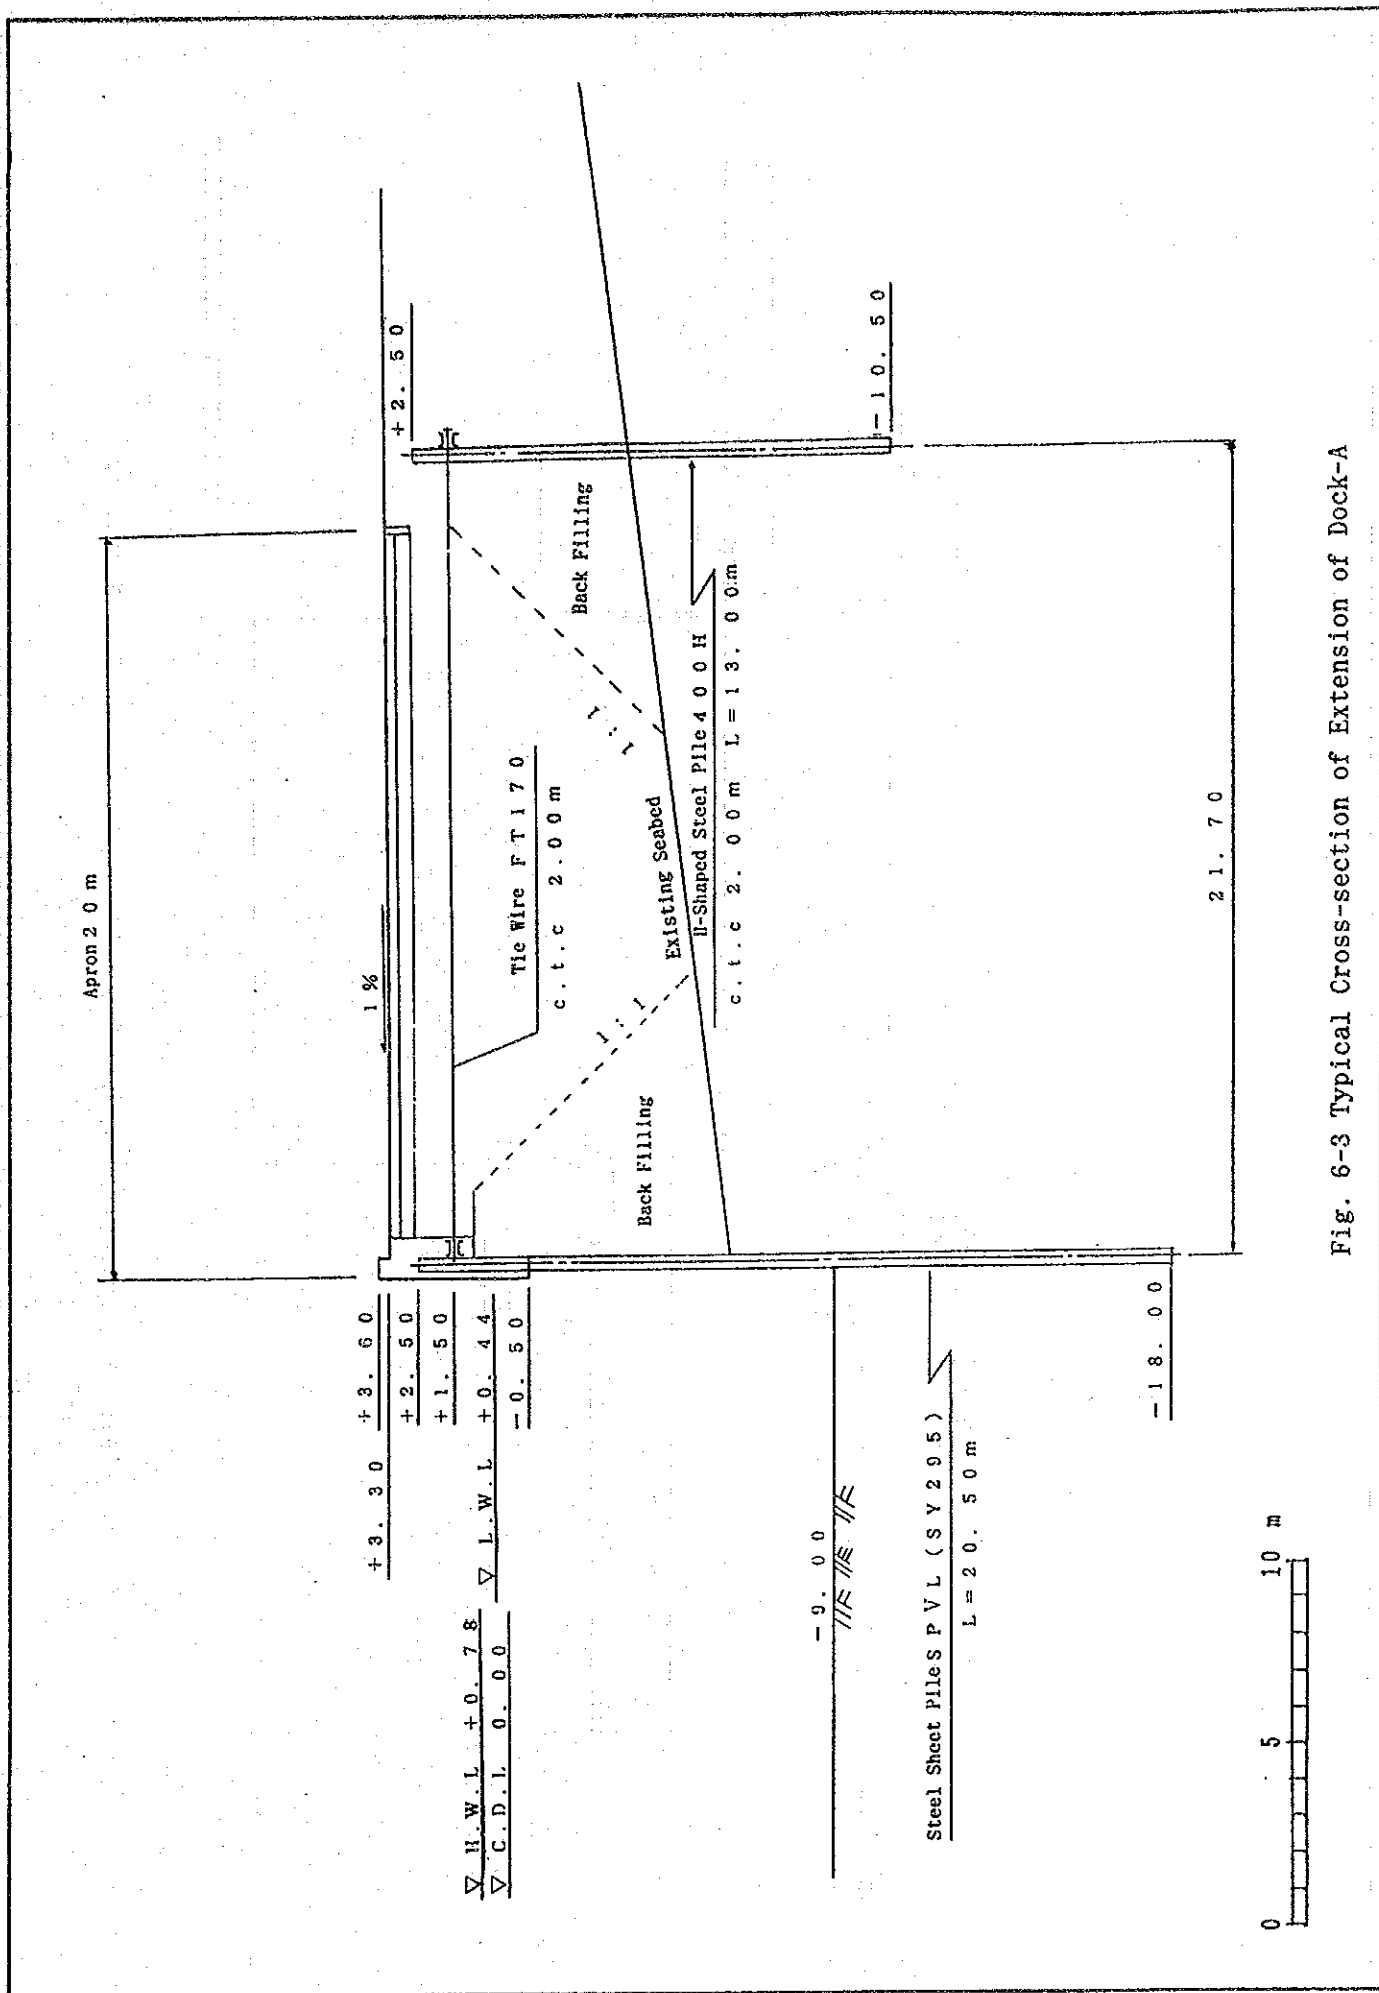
Typical Cross-section of Extension of Dock-A
